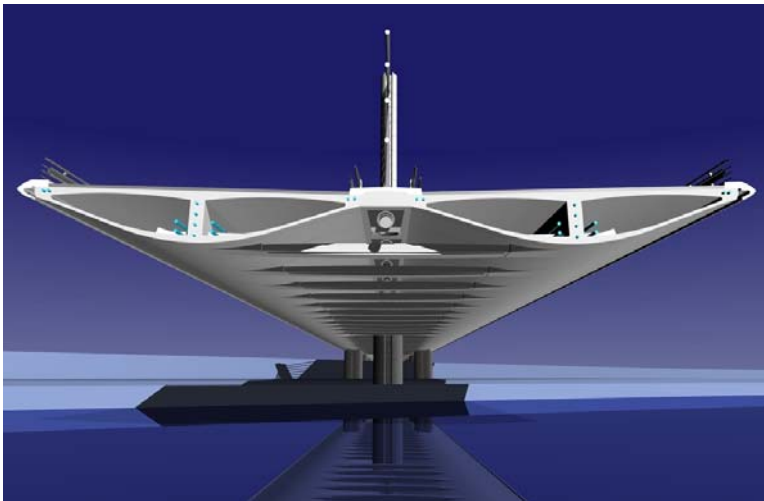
Cable-stayed bridge over Odra river near to Ostrava
